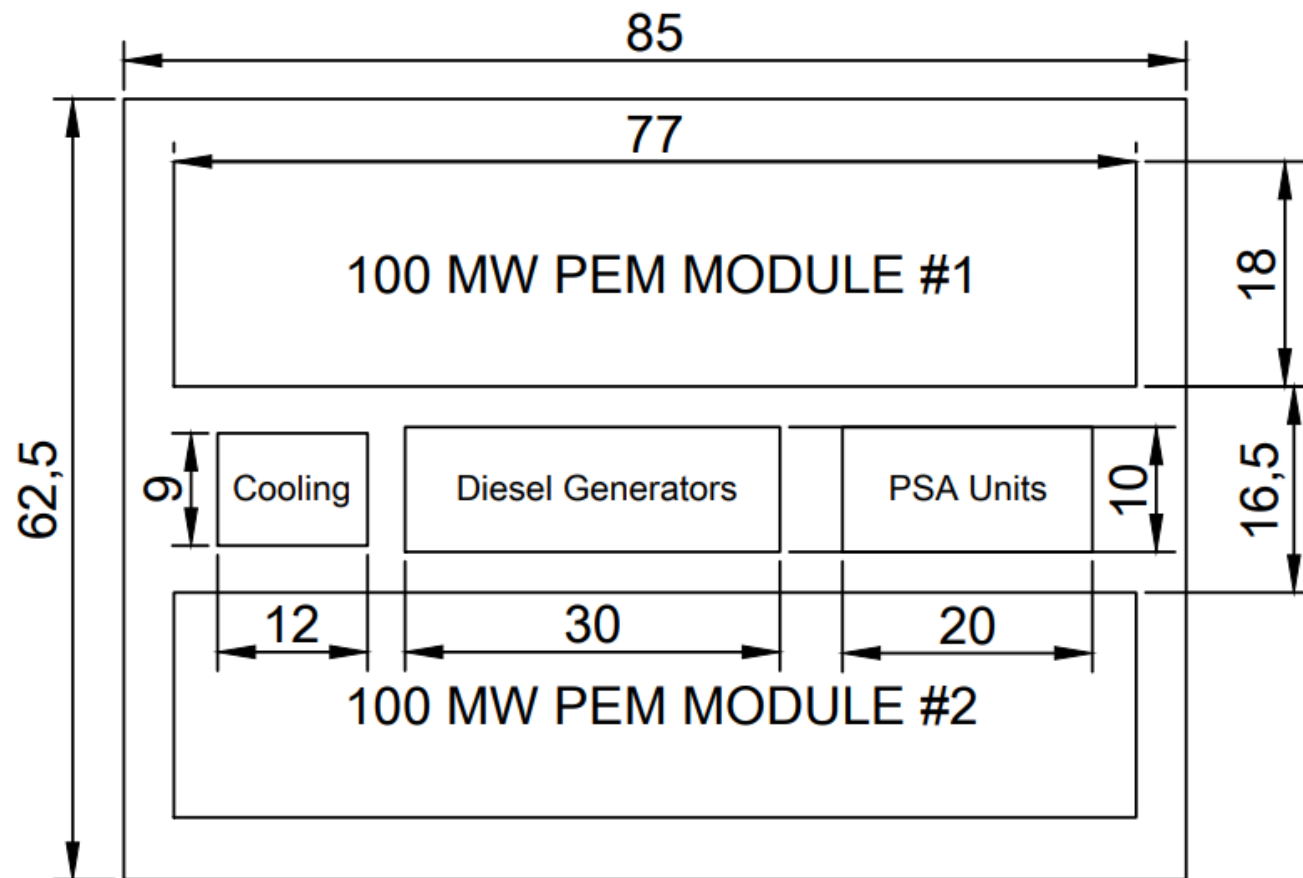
Deck #3 2D Layout at 38 meters (PEM Deck #1)
